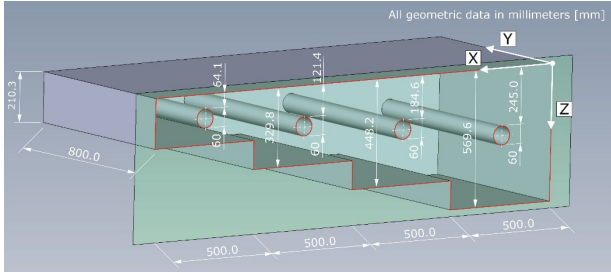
3D technical drawing of BAM specimen "Pk266" made of concrete with tendon ducts.
